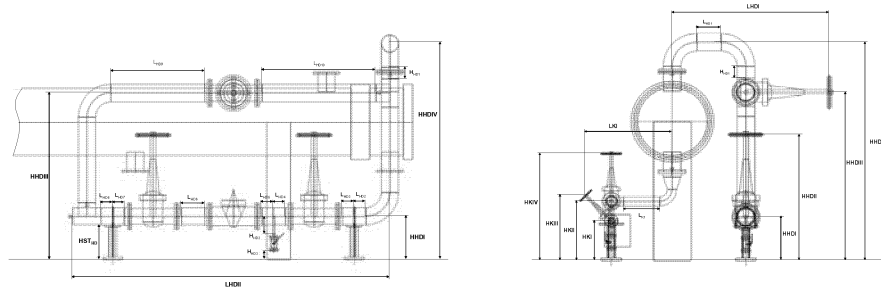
Modular planning process for engineering reuse (left side) and standardization of an equipment layout (right side)
